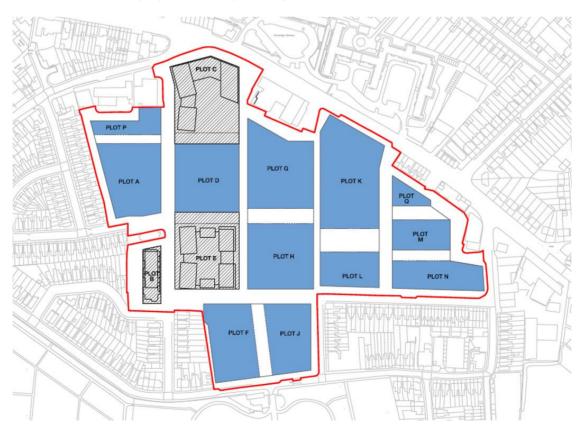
Proposed Masterplan Layout (Patel Taylor, October 2020)
